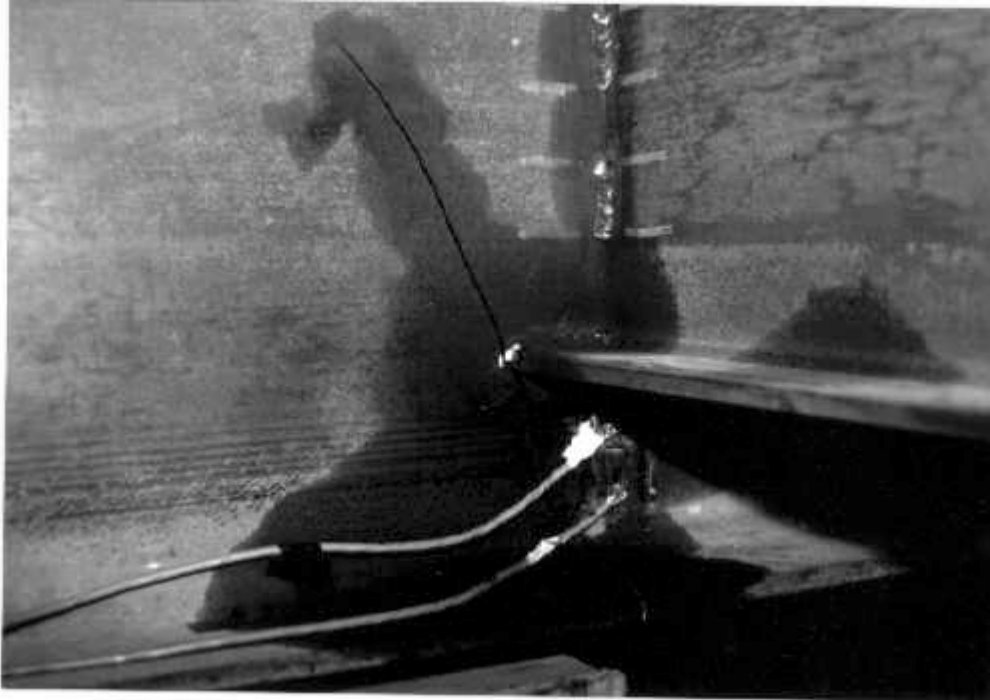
Typical vertical beam crack located along toe of lower flange connection weld in staggered diaphragm tests
